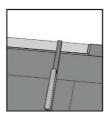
Last row (and perhaps also first row). The Minimum width of the last plank should not be less than 50 mm. Remember distance to wall is 12-15 mm. Tip! Put a spacer before measuring cut the planks lengthwise and glue the short ends. See instructions below.
